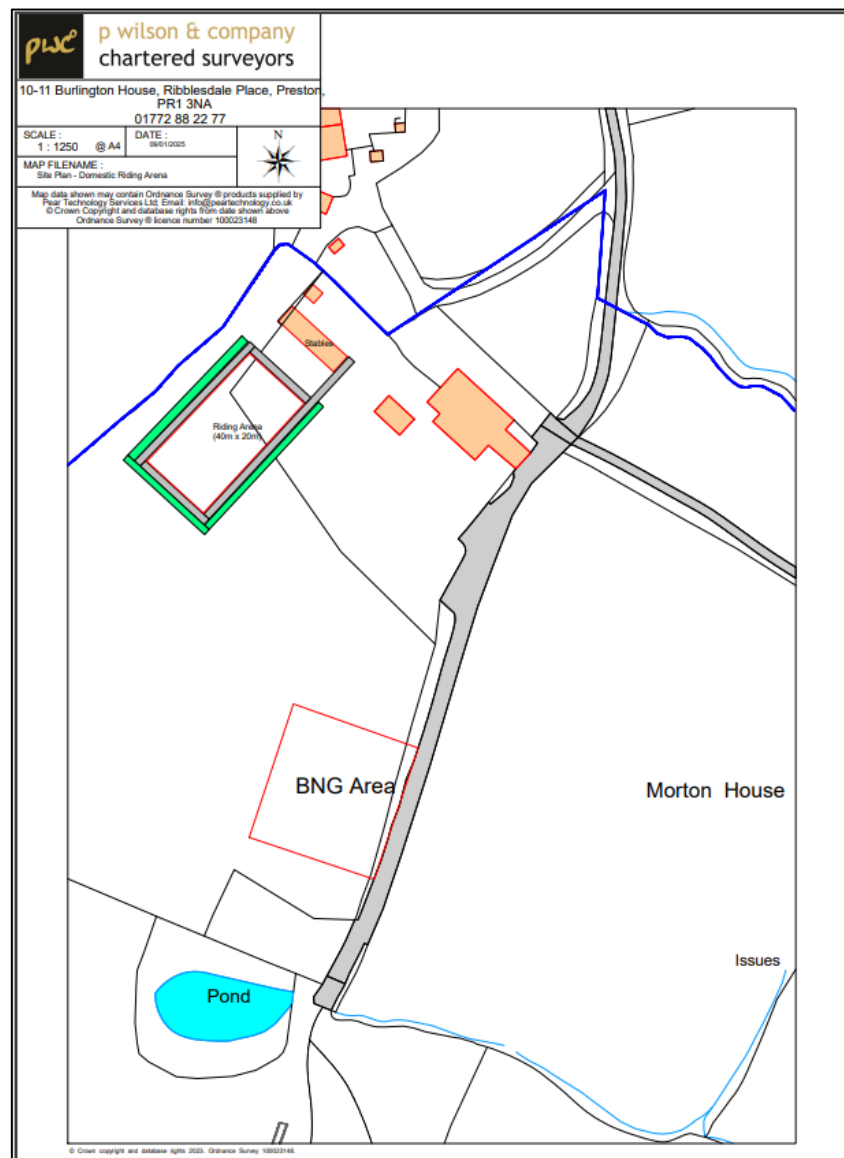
Proposed site plan (© P Wilson & Company)
